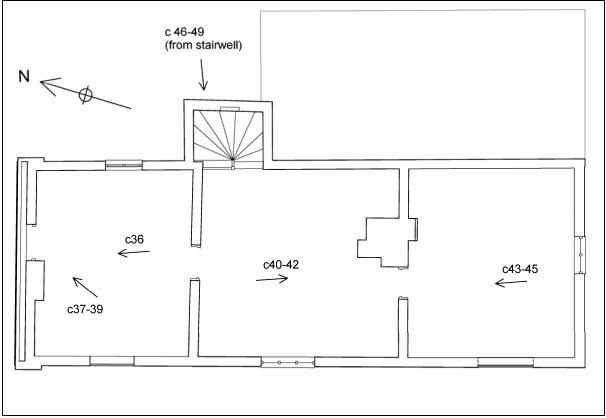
Location of photographs of Hill Farm, Fenny Drayton, second floor held in archive
